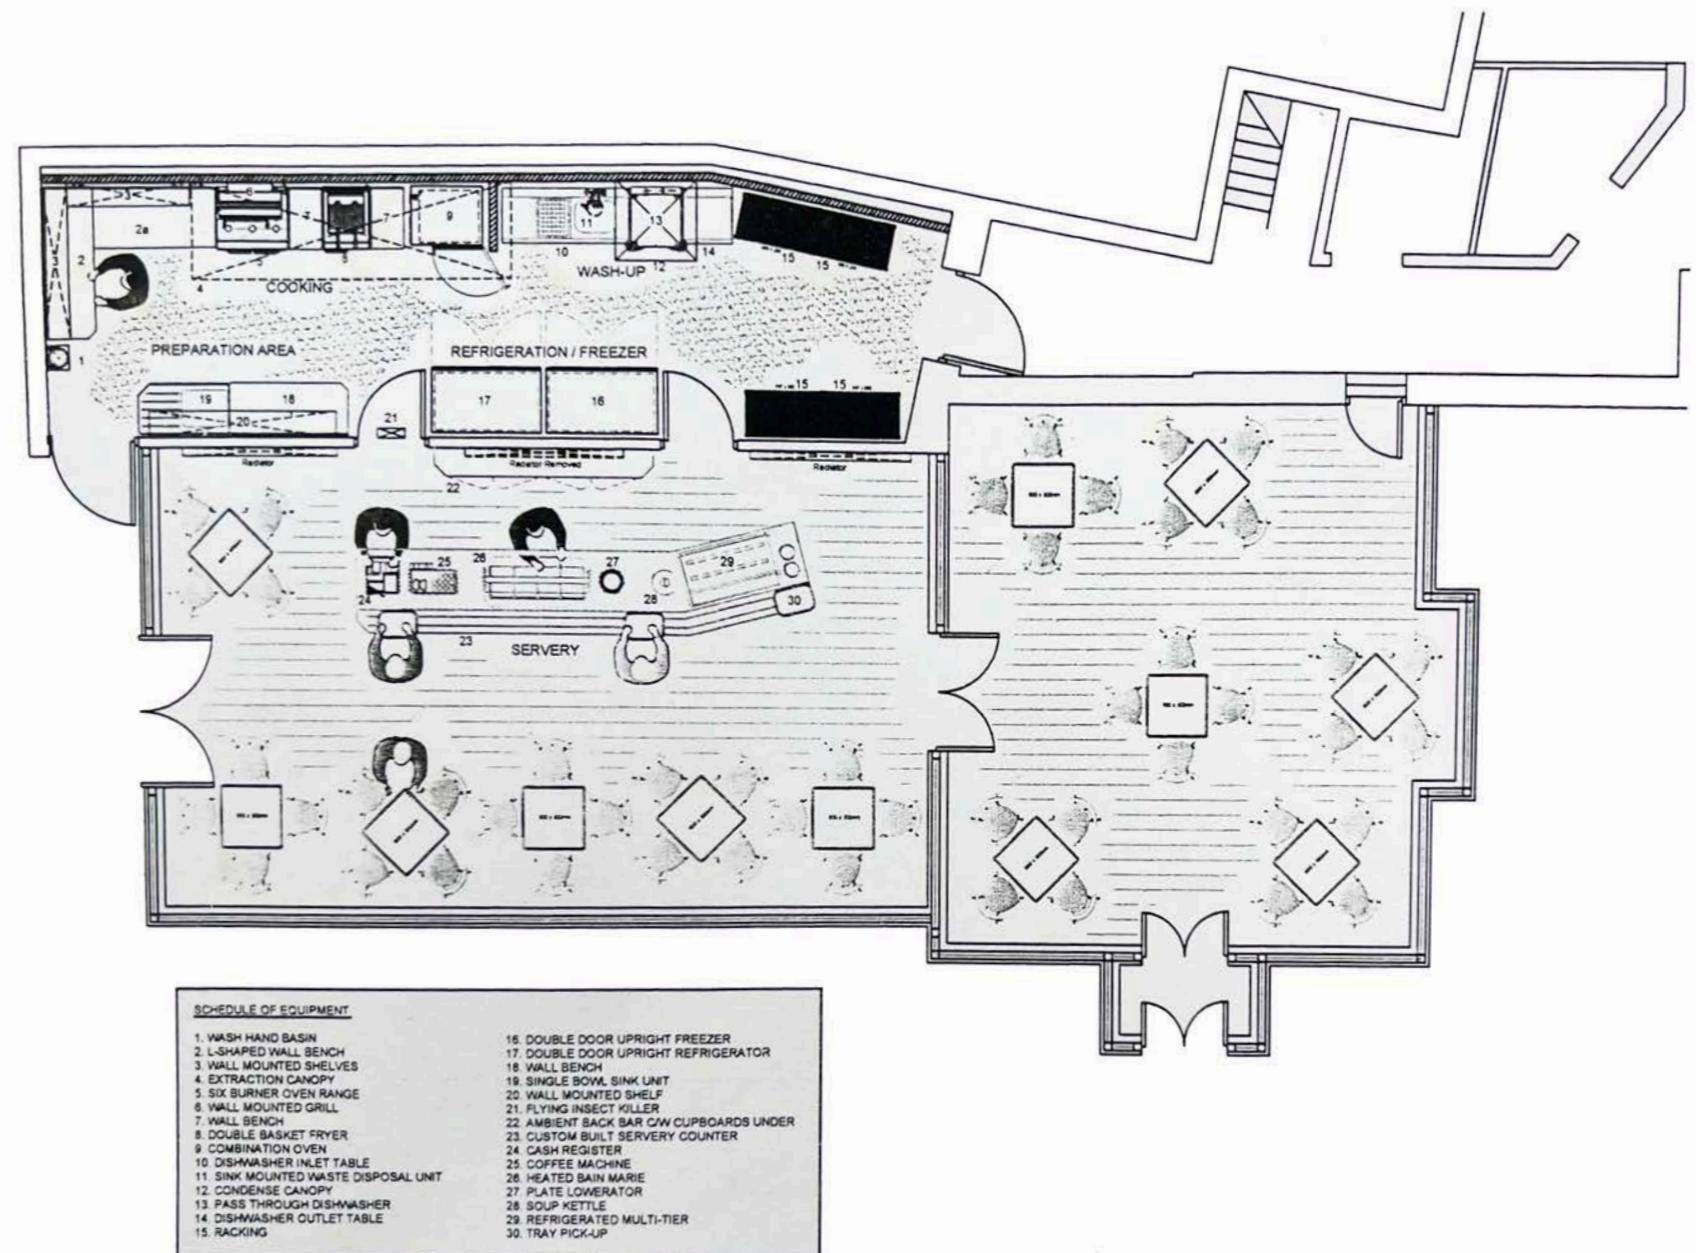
Ebley House - Proposed Conservatory Floor Plan, 2003
